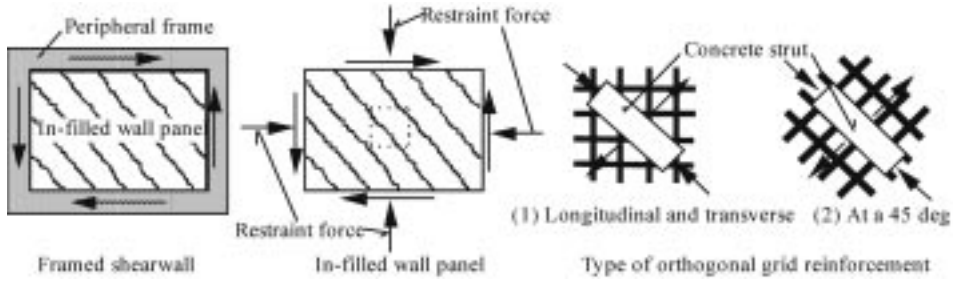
Concrete struts formed in cracked wall of shearwalls and type of orthogonal grid reinforcement
